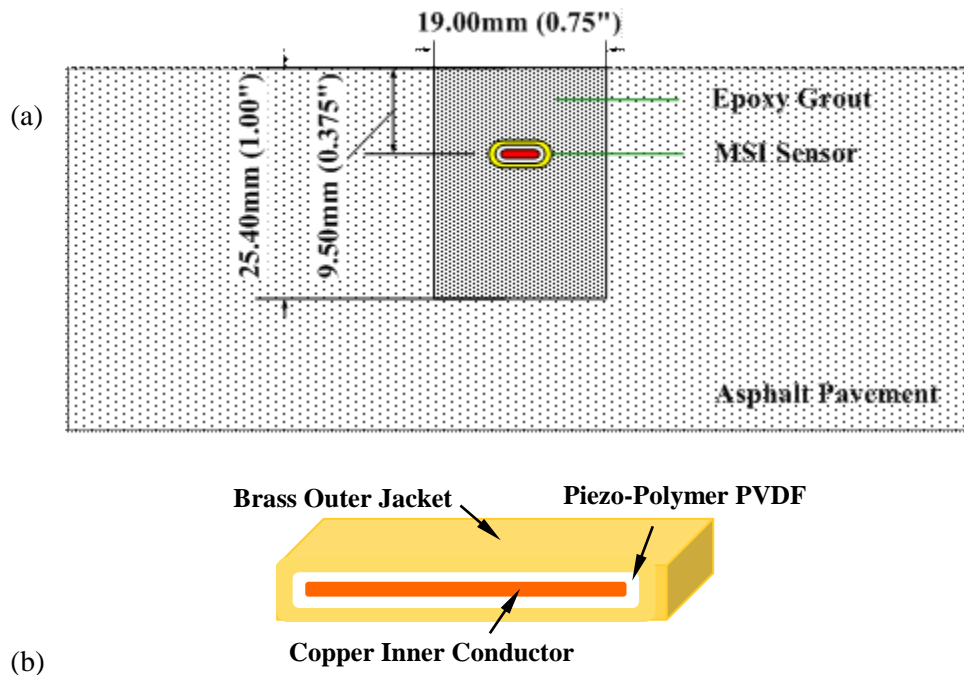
(a) MSI® installation details (drawn by author based on IRD Inc. n.d.)
